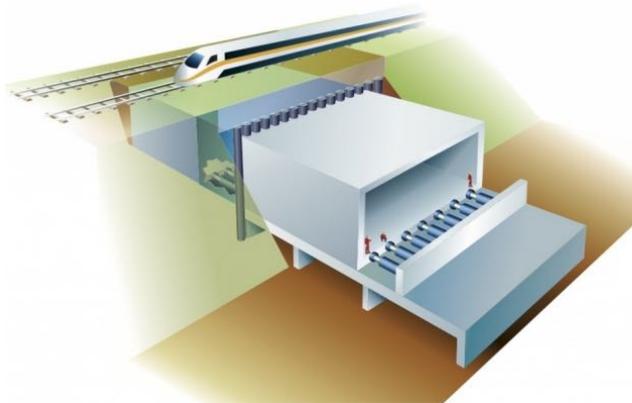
Principle of box jacking of a concrete tunnel segment into the ground (from: <https://www.jackedstructures.com/box-jacking.html>).
